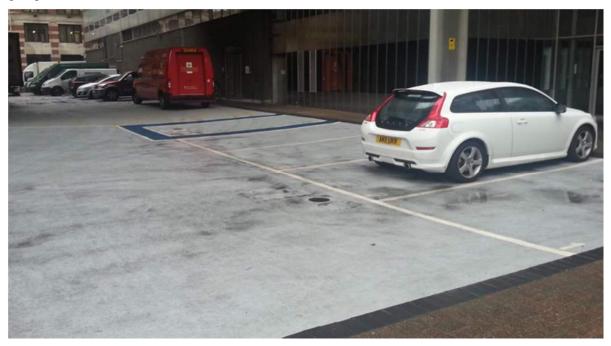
Example of thermoplastic paint used to demarcate bays on a concrete surface
